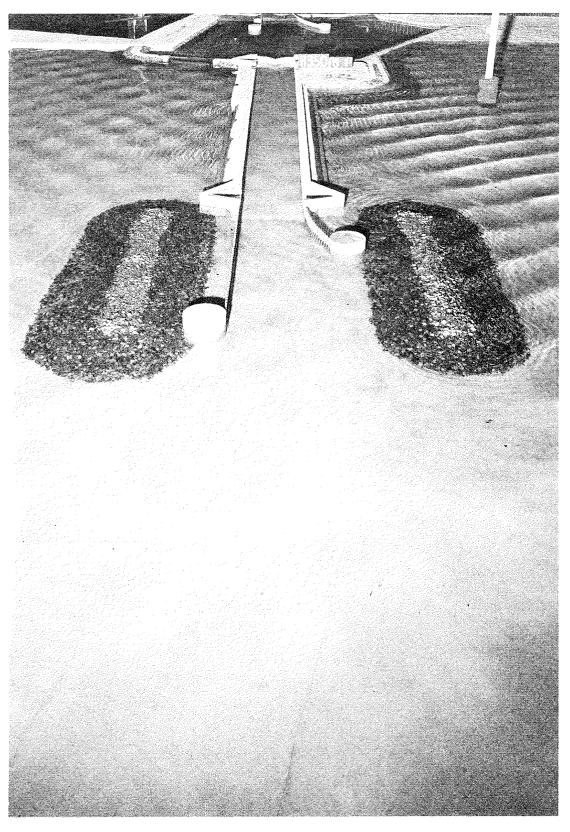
Typical wave patterns at lock entrance for Plan 12A; 4-sec, 4-ft waves from NW; swl = +1 ft msl
